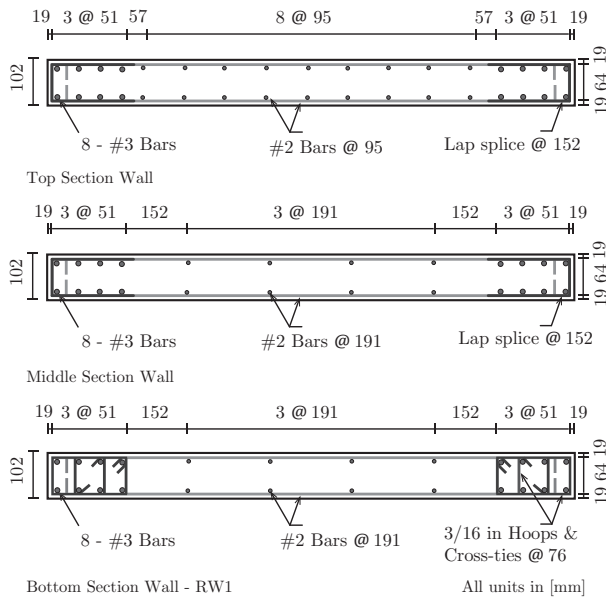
Reinforcement details of specimen wall RW1, which was used by Thomsen and Wallace [64] in 1995.
